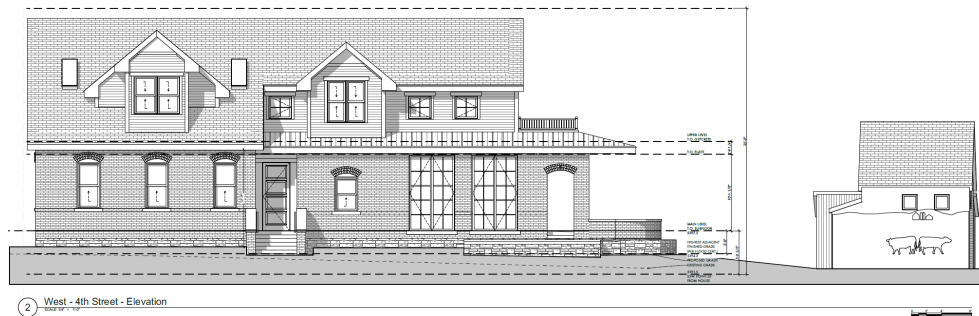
Proposed West (4th Street) Elevation. Not to scale.
